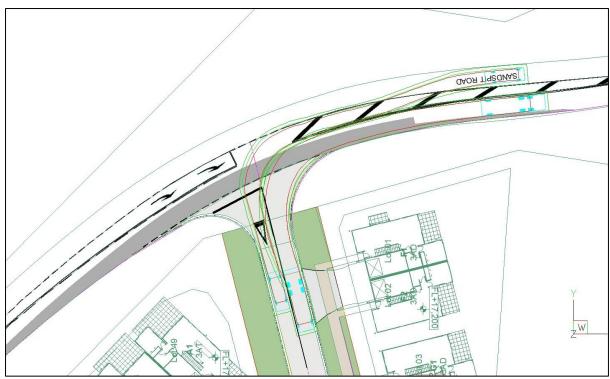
Sandspit Road Intersection - 10.3 metre Truck (Left In) & 6.3 metre Van (Right Out)
